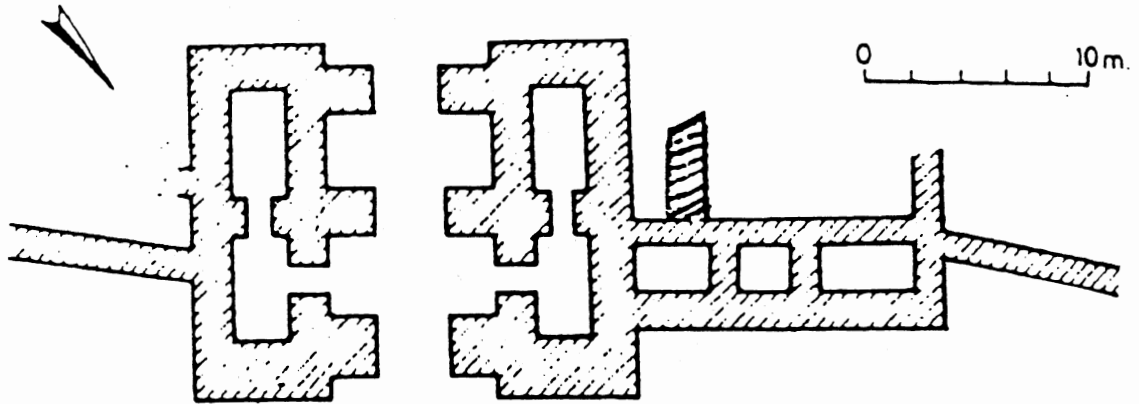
Plan of Stratum 2 Gate, Area K, Hazor (after Yadin)
